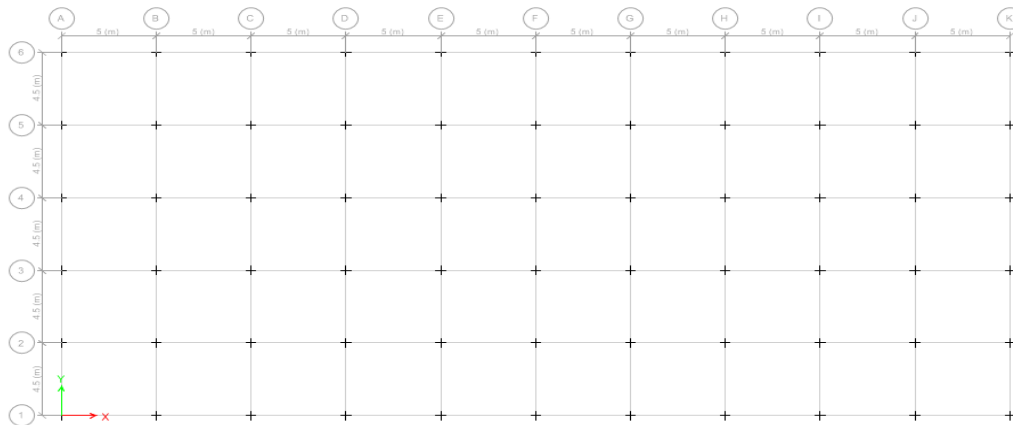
Plan of Rc building of 50 m x 22.5 m
